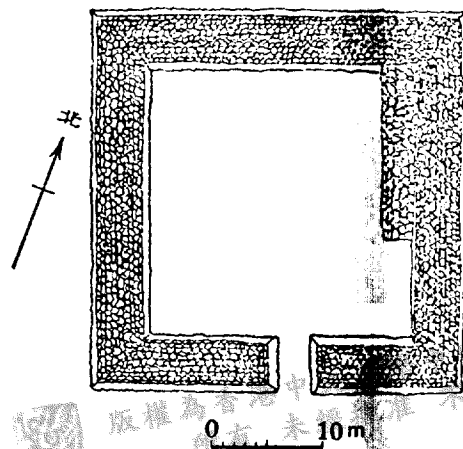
Plan of a beacon tower, Chi-lu-sai — after KG, 73.2.106
